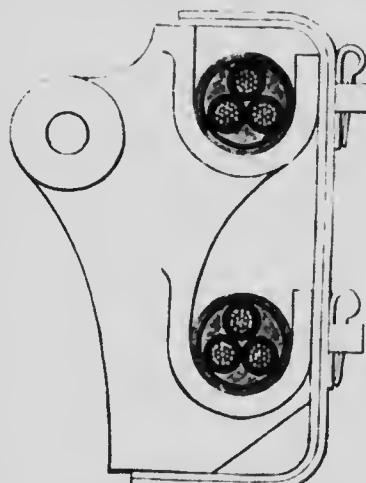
High-tension Cables and Support, Central London Railway.
